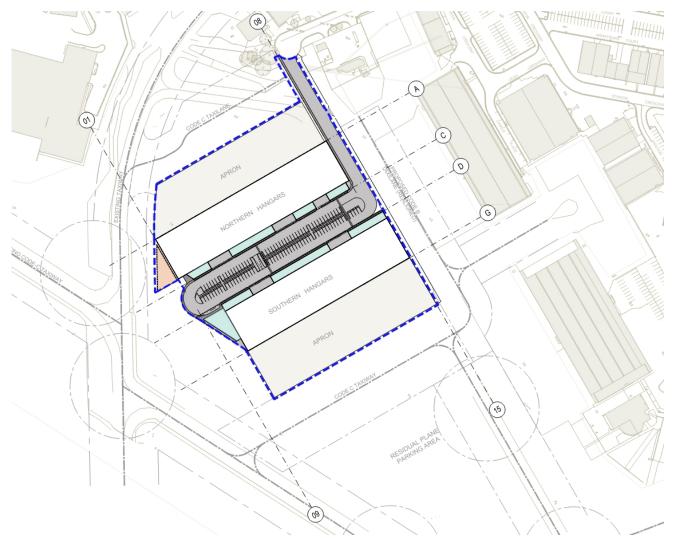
Aviation Hangar Project – Site plan (Crawford Architects)
